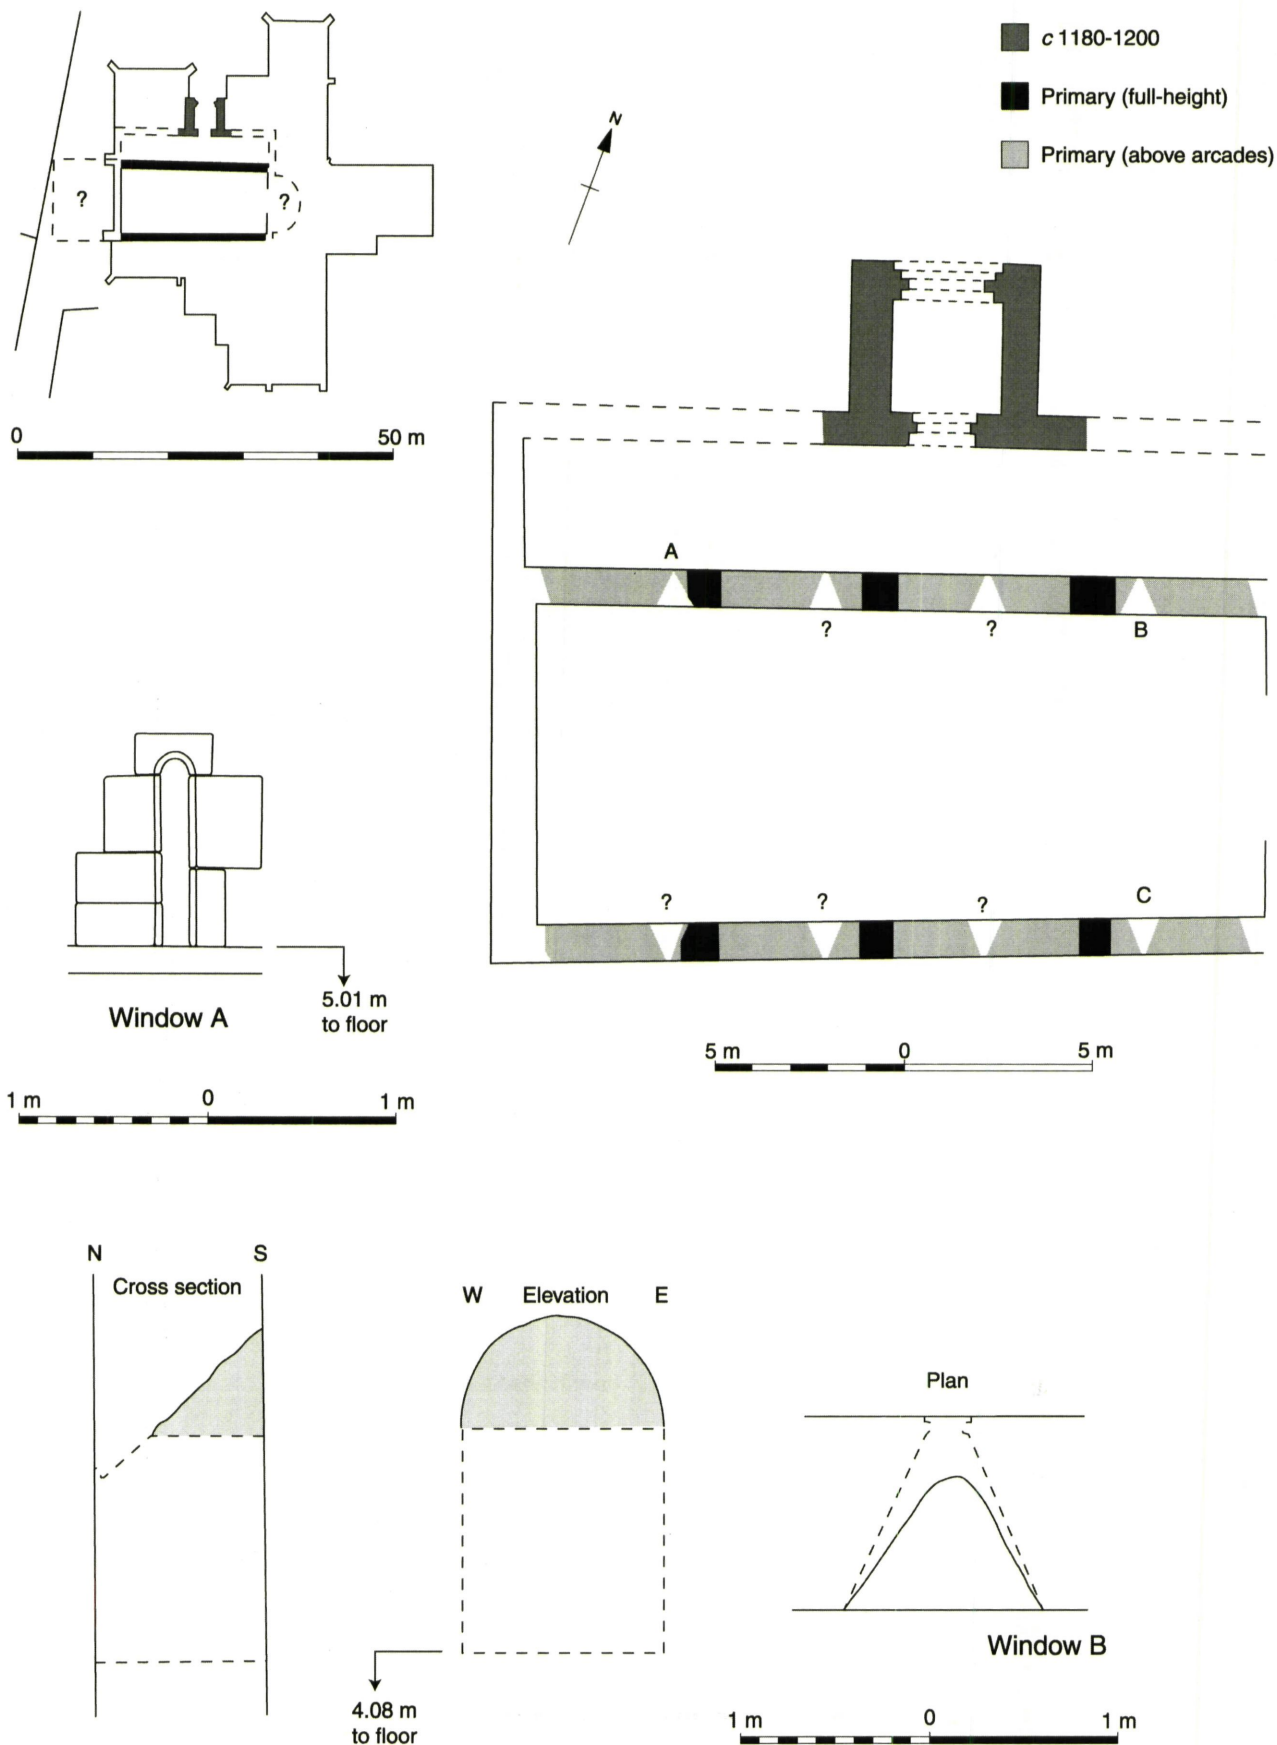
St Mary's church: plan of church with details of Norman work in the nave (after drawing by J Blair).
